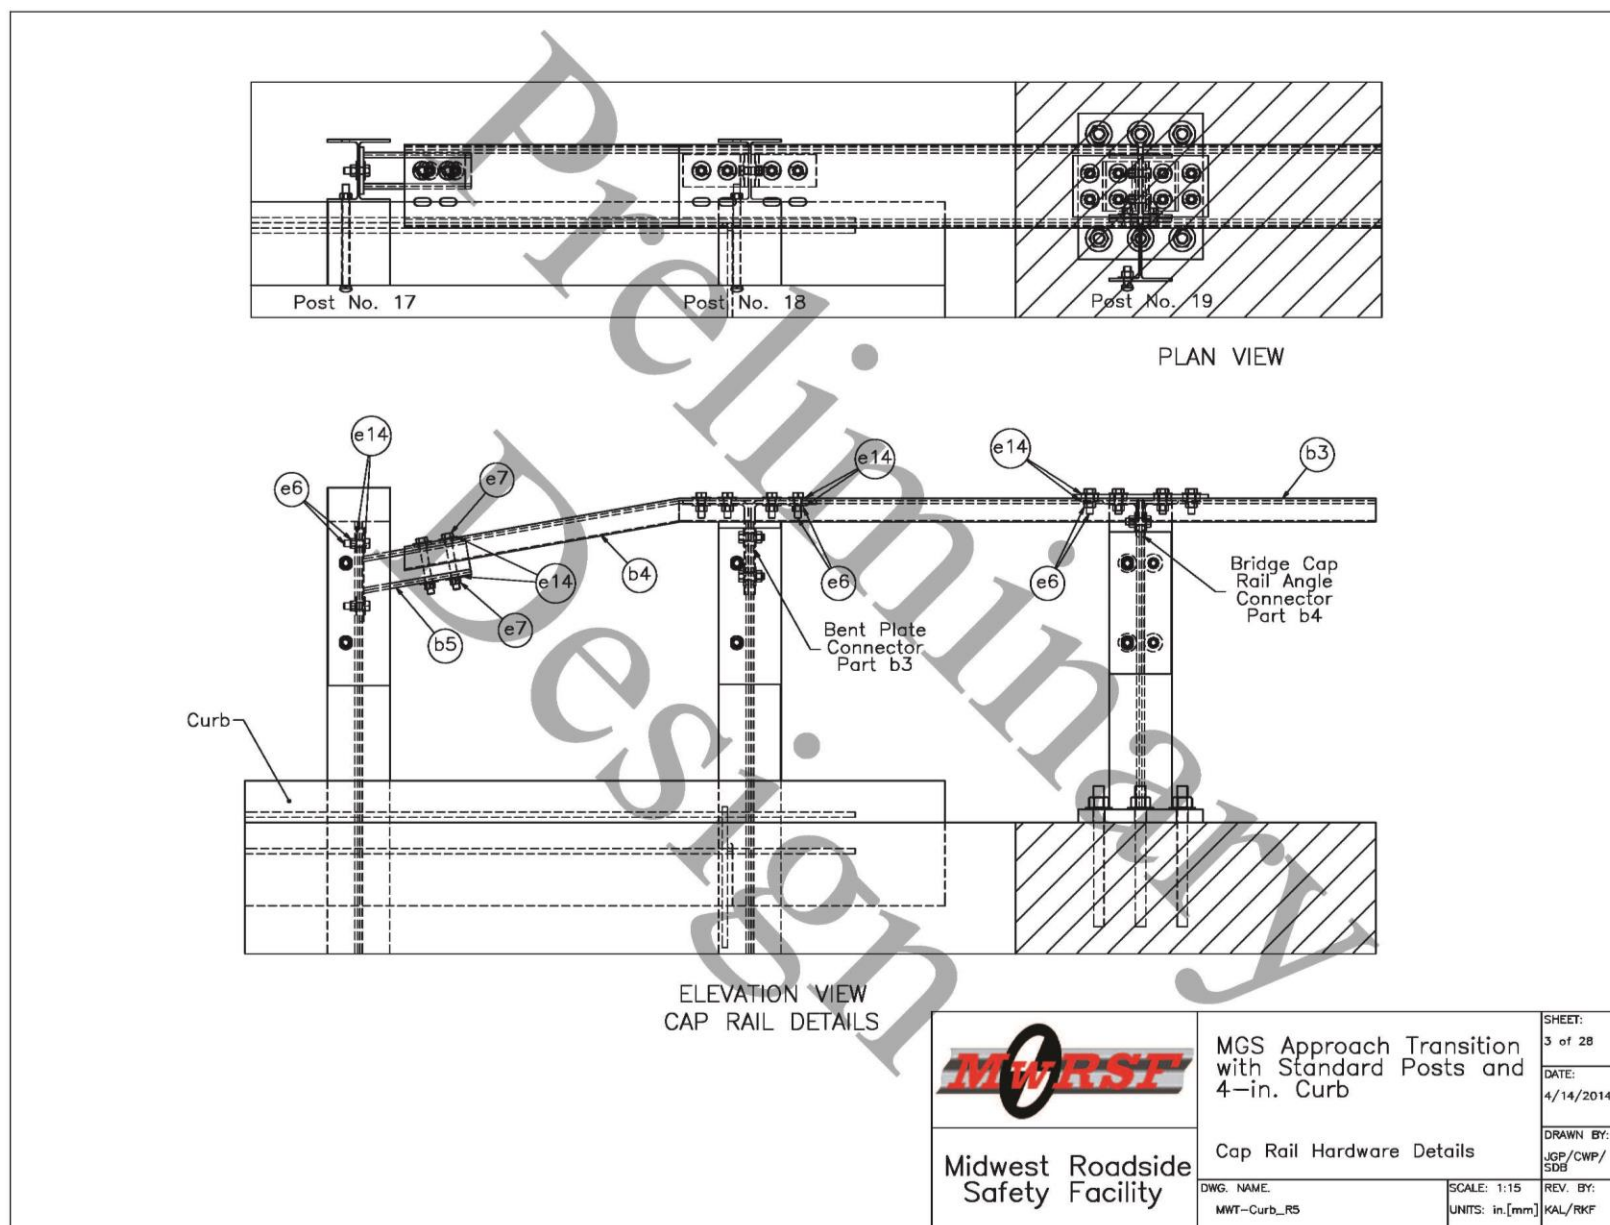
Cap Rail Hardware Details, Test No. MWTC-1
